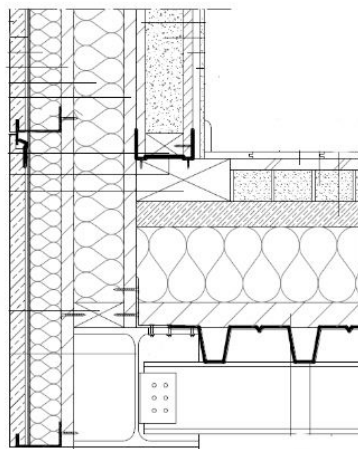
Particular of the lowest vertical/horizontal wall junction.
